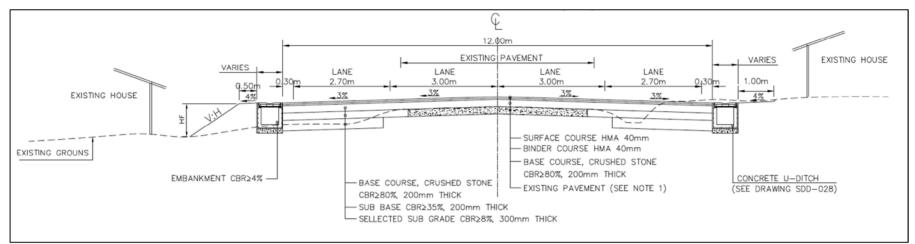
Cross Section Rehabilitation of Existing Pavement and Overlay (TC6)
